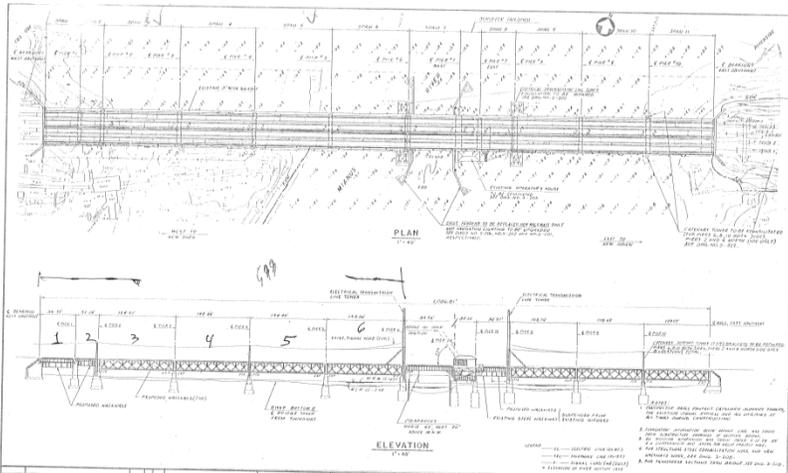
Plan and Elevated View Drawings of all spans of Cos Cob Bridge Page 4/59 of A.G. Lichtenstein Drawings
